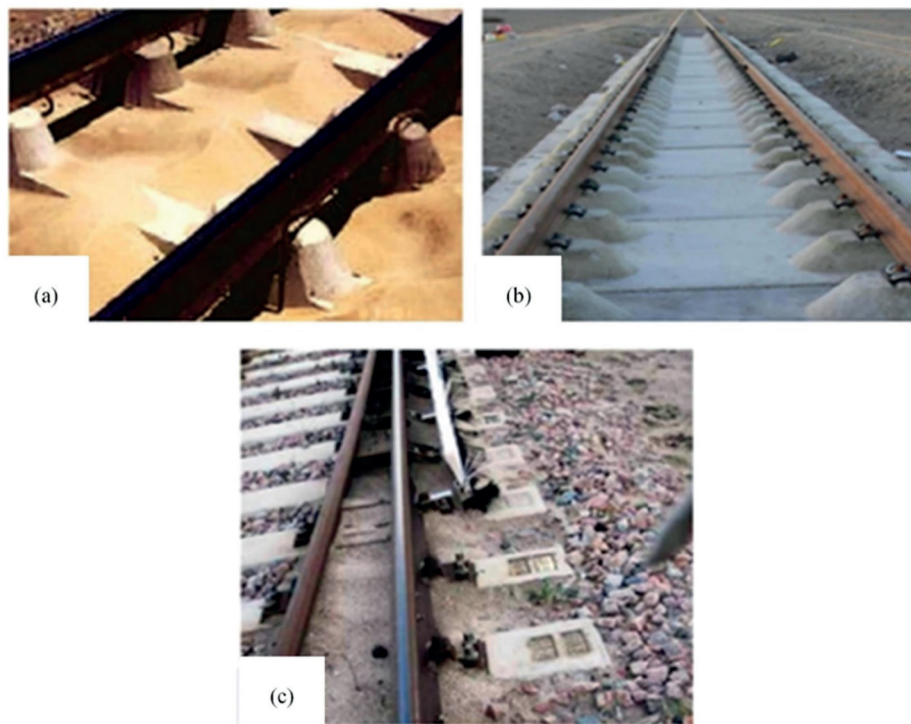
a) sleepers with elevated rail seats; b) slab track system with elevated rail seats; c) TurbFly brushes installed next to the rail track [10]
